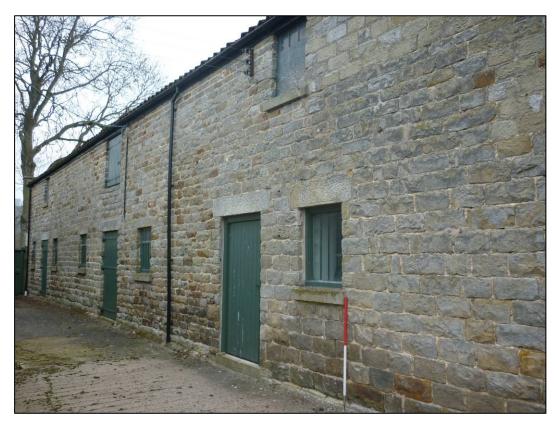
South elevation of granary/stables, looking NW (photo 1/49).
